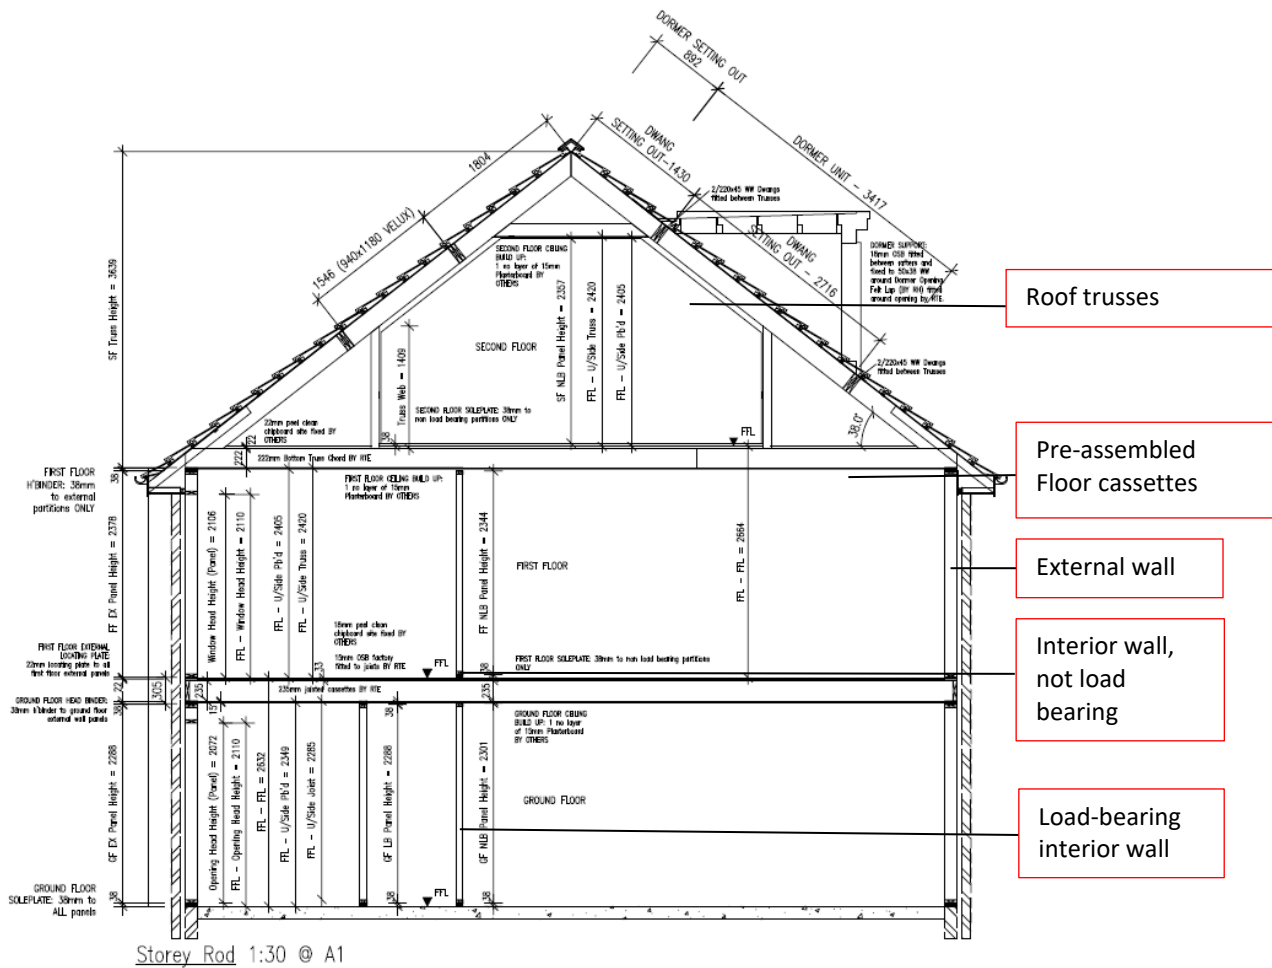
Sectional drawings, Everett Grand. ©Robertson Timber Engineering
